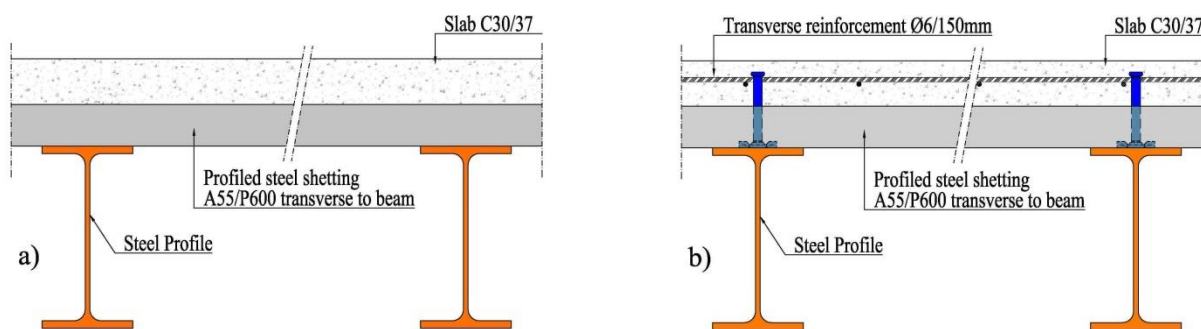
Type of beams used for analysis: a) steel beams; b) composite beams
